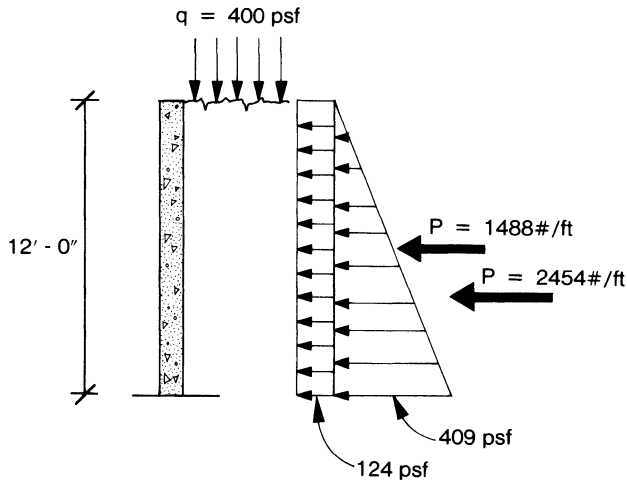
Example 11-11—Moment induced into stem of the cantilever retaining wall.
